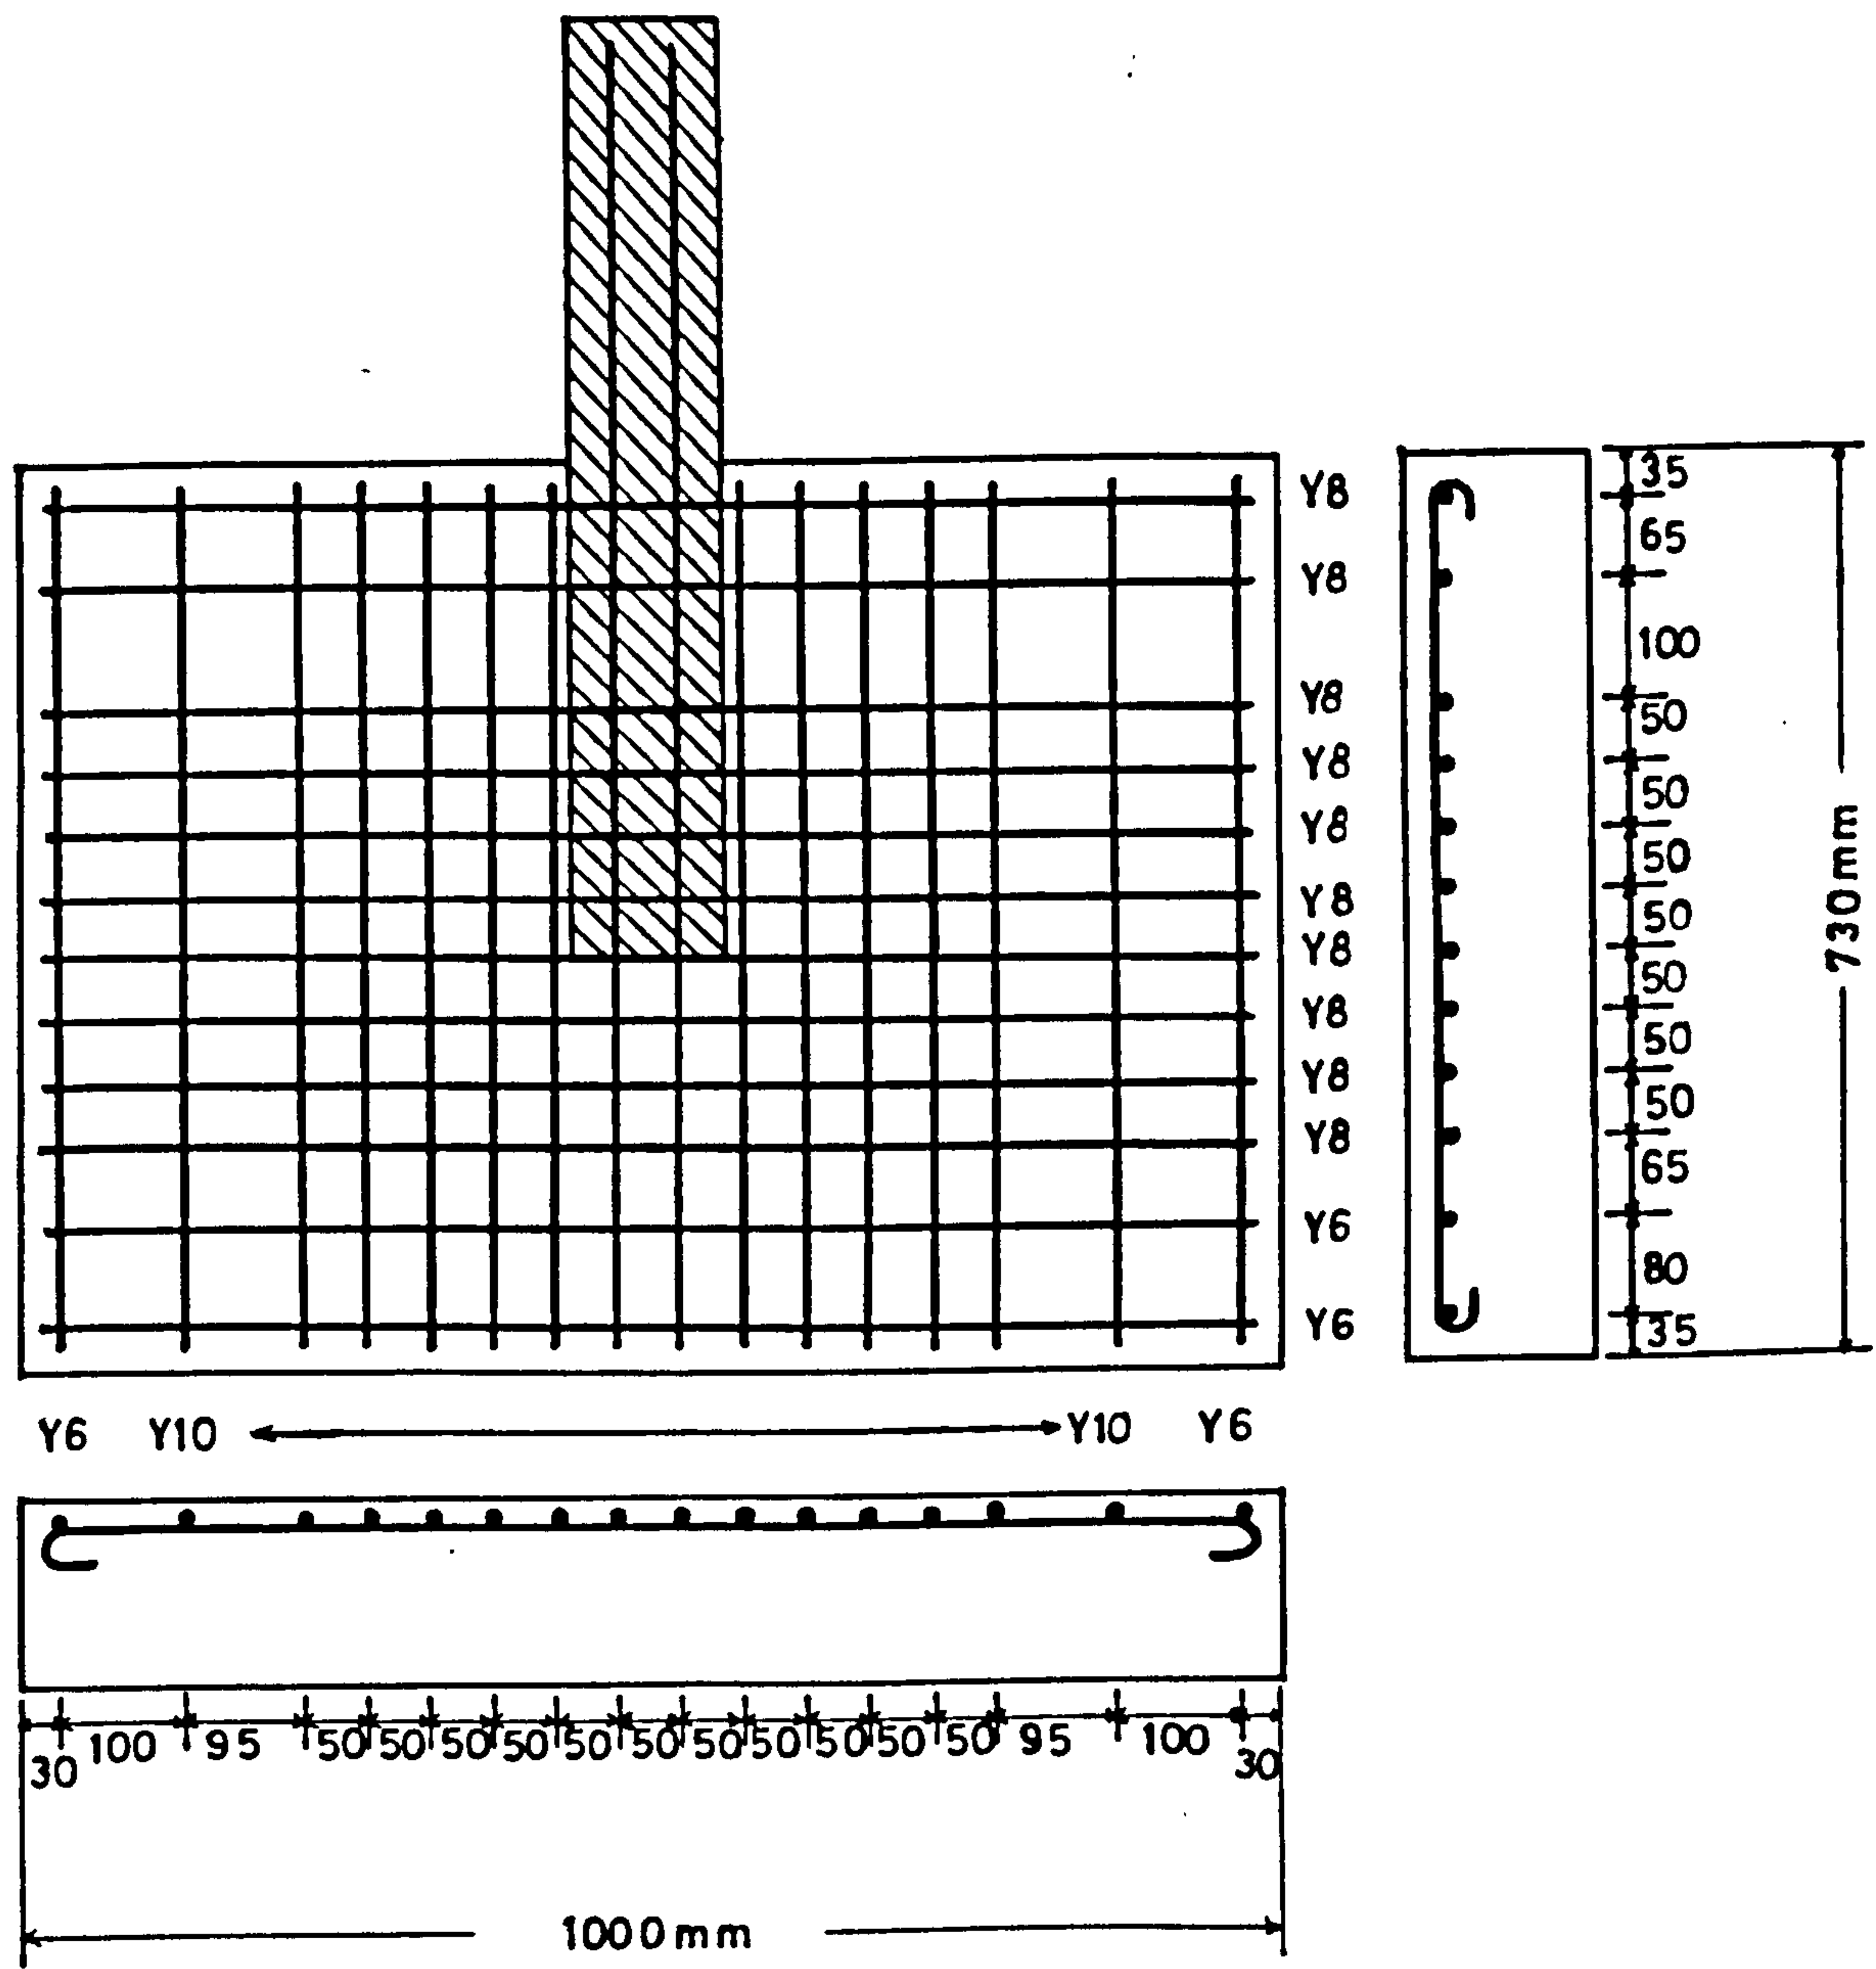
Arrangement of reinforcing bars in the slab of model MT10.
